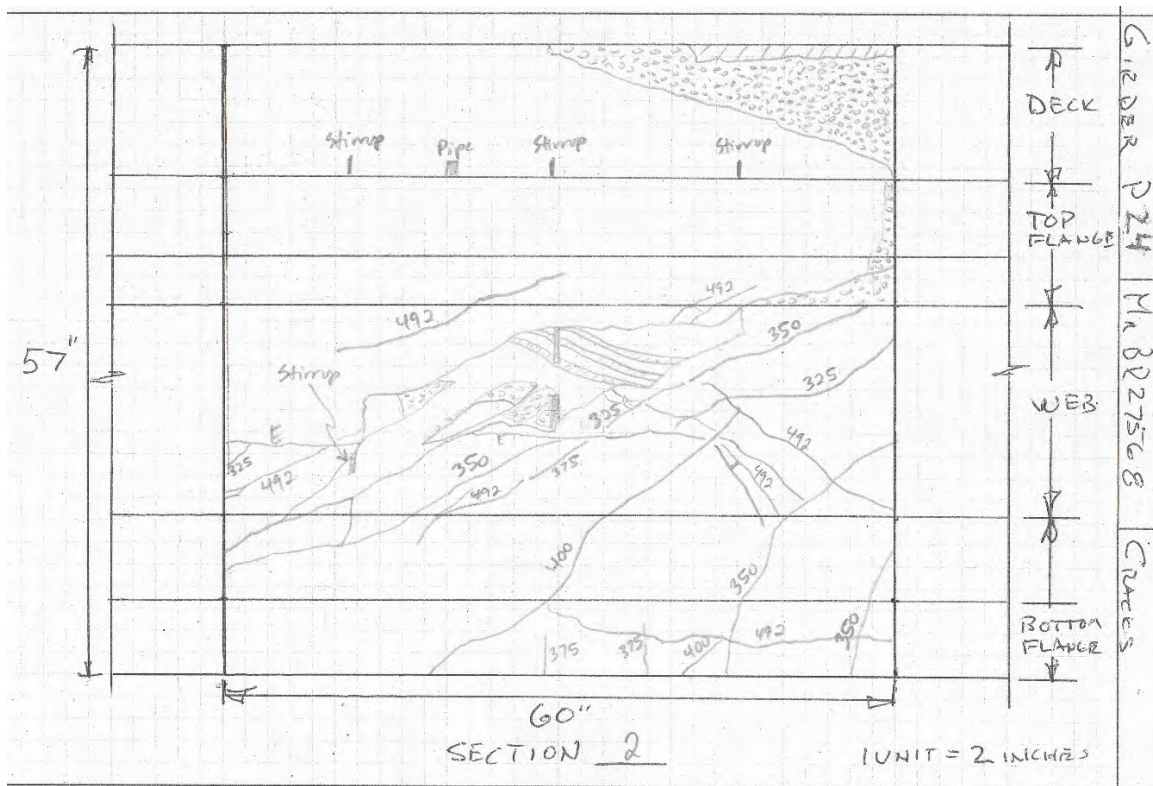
Girder P24 crack pattern – Section 2
